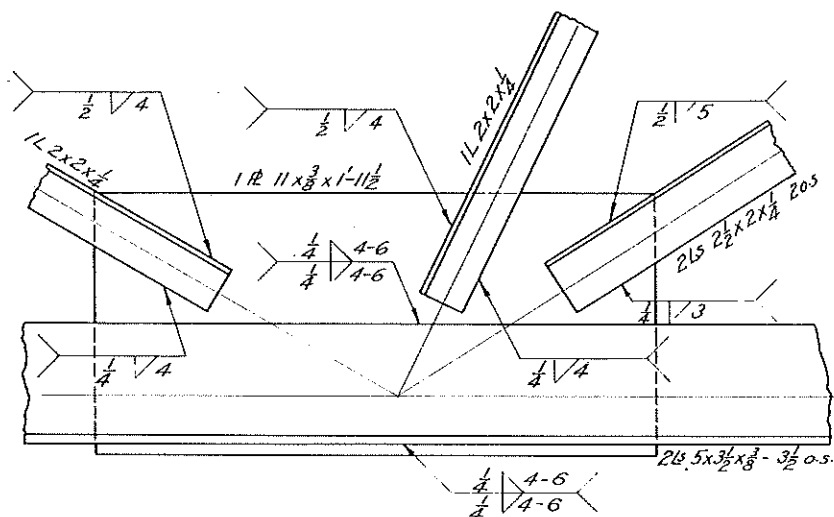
Application of welding symbol to a structural connection.
